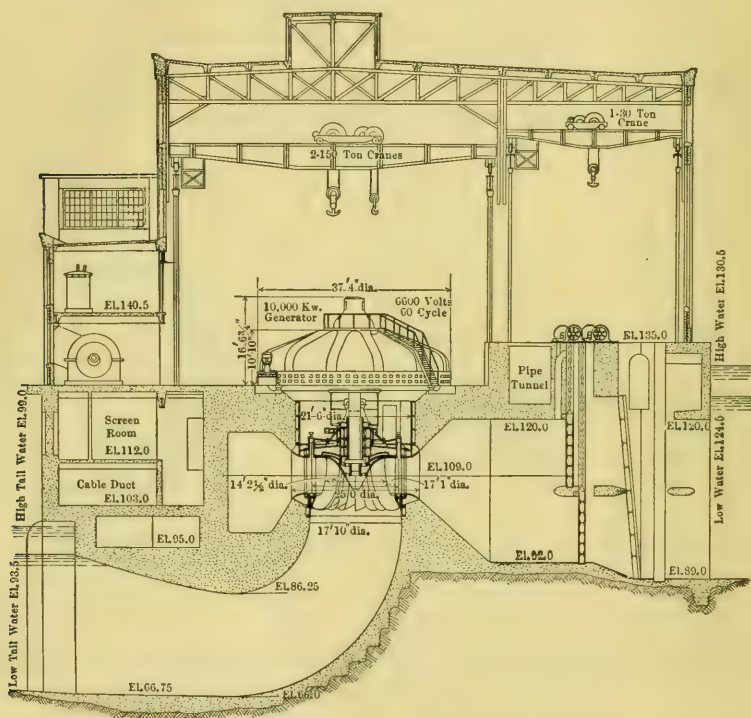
Sectional Elevation of Power House, Cedars Rapids Mfg. and Power Company.
